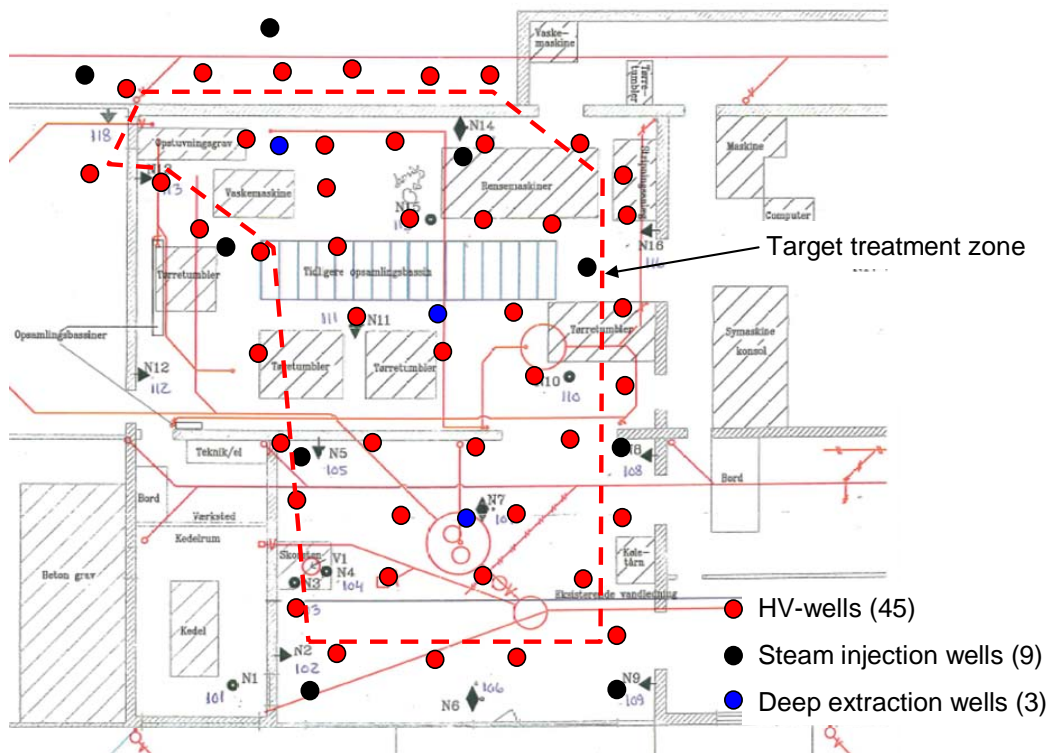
Well layout showing heaters inside the dry cleaning facility between machines walls and cables.
